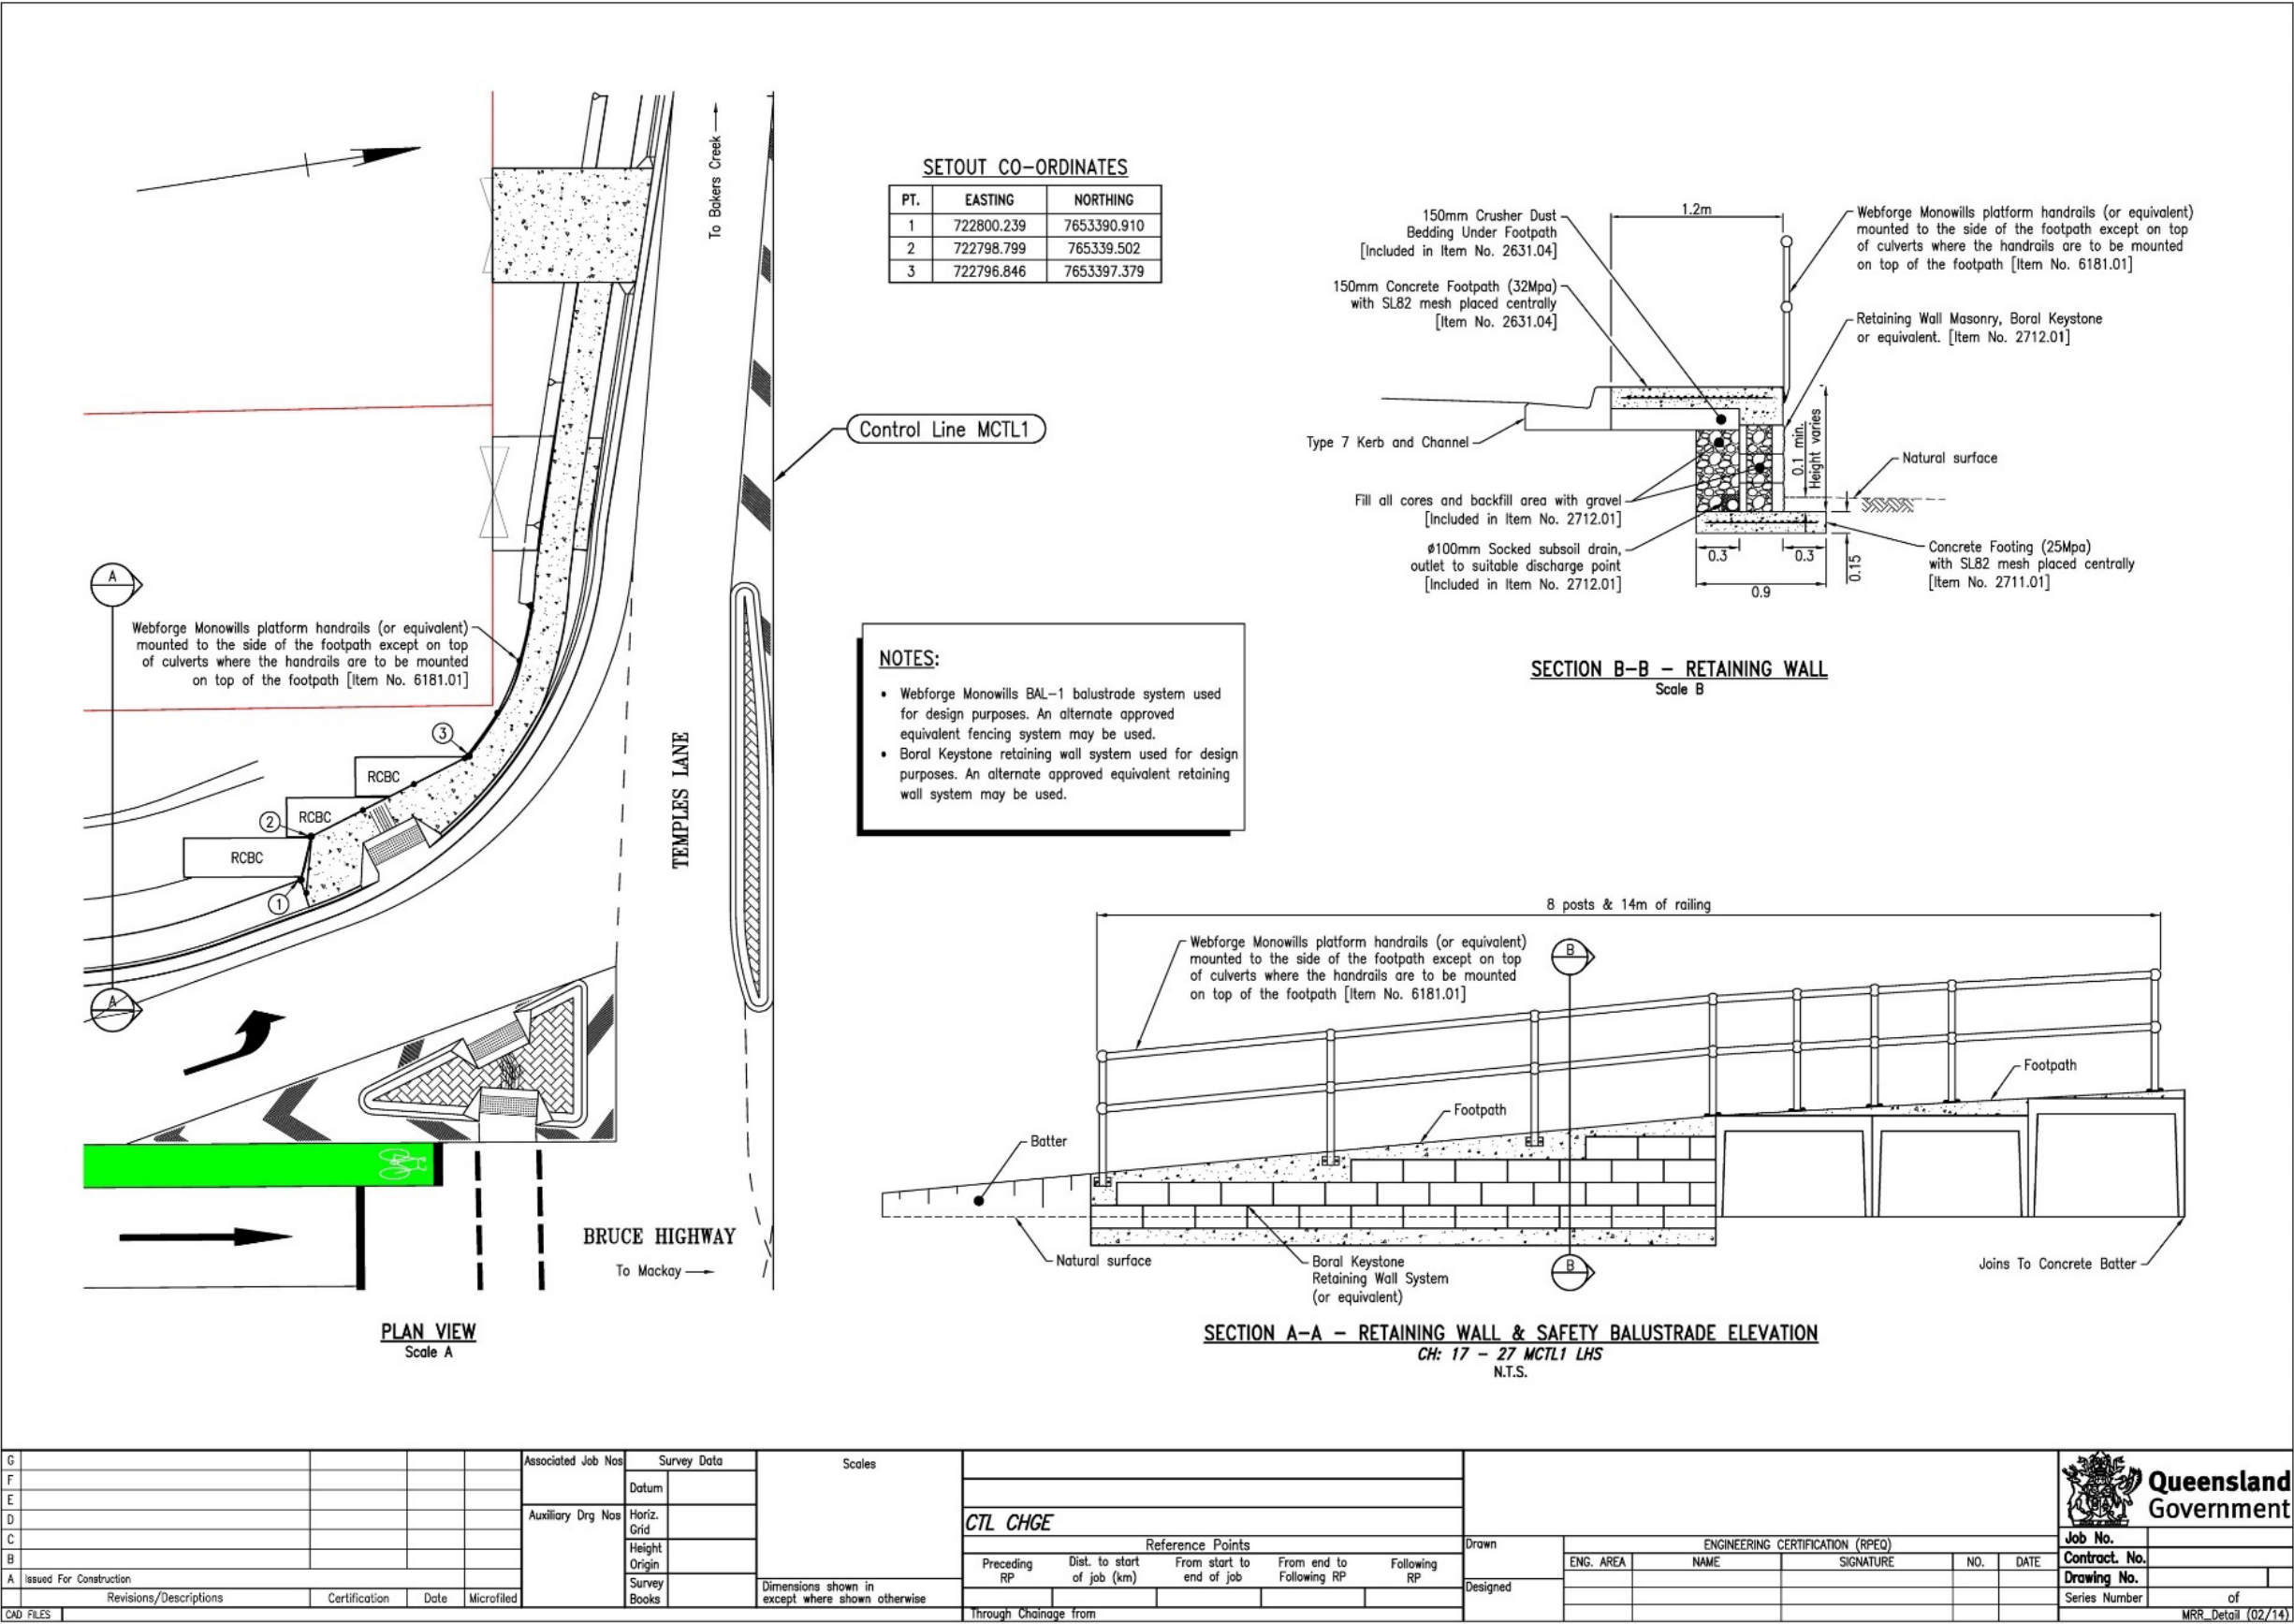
(e) – Cycle lane facilities layout – generic example sheet 1 of 2
